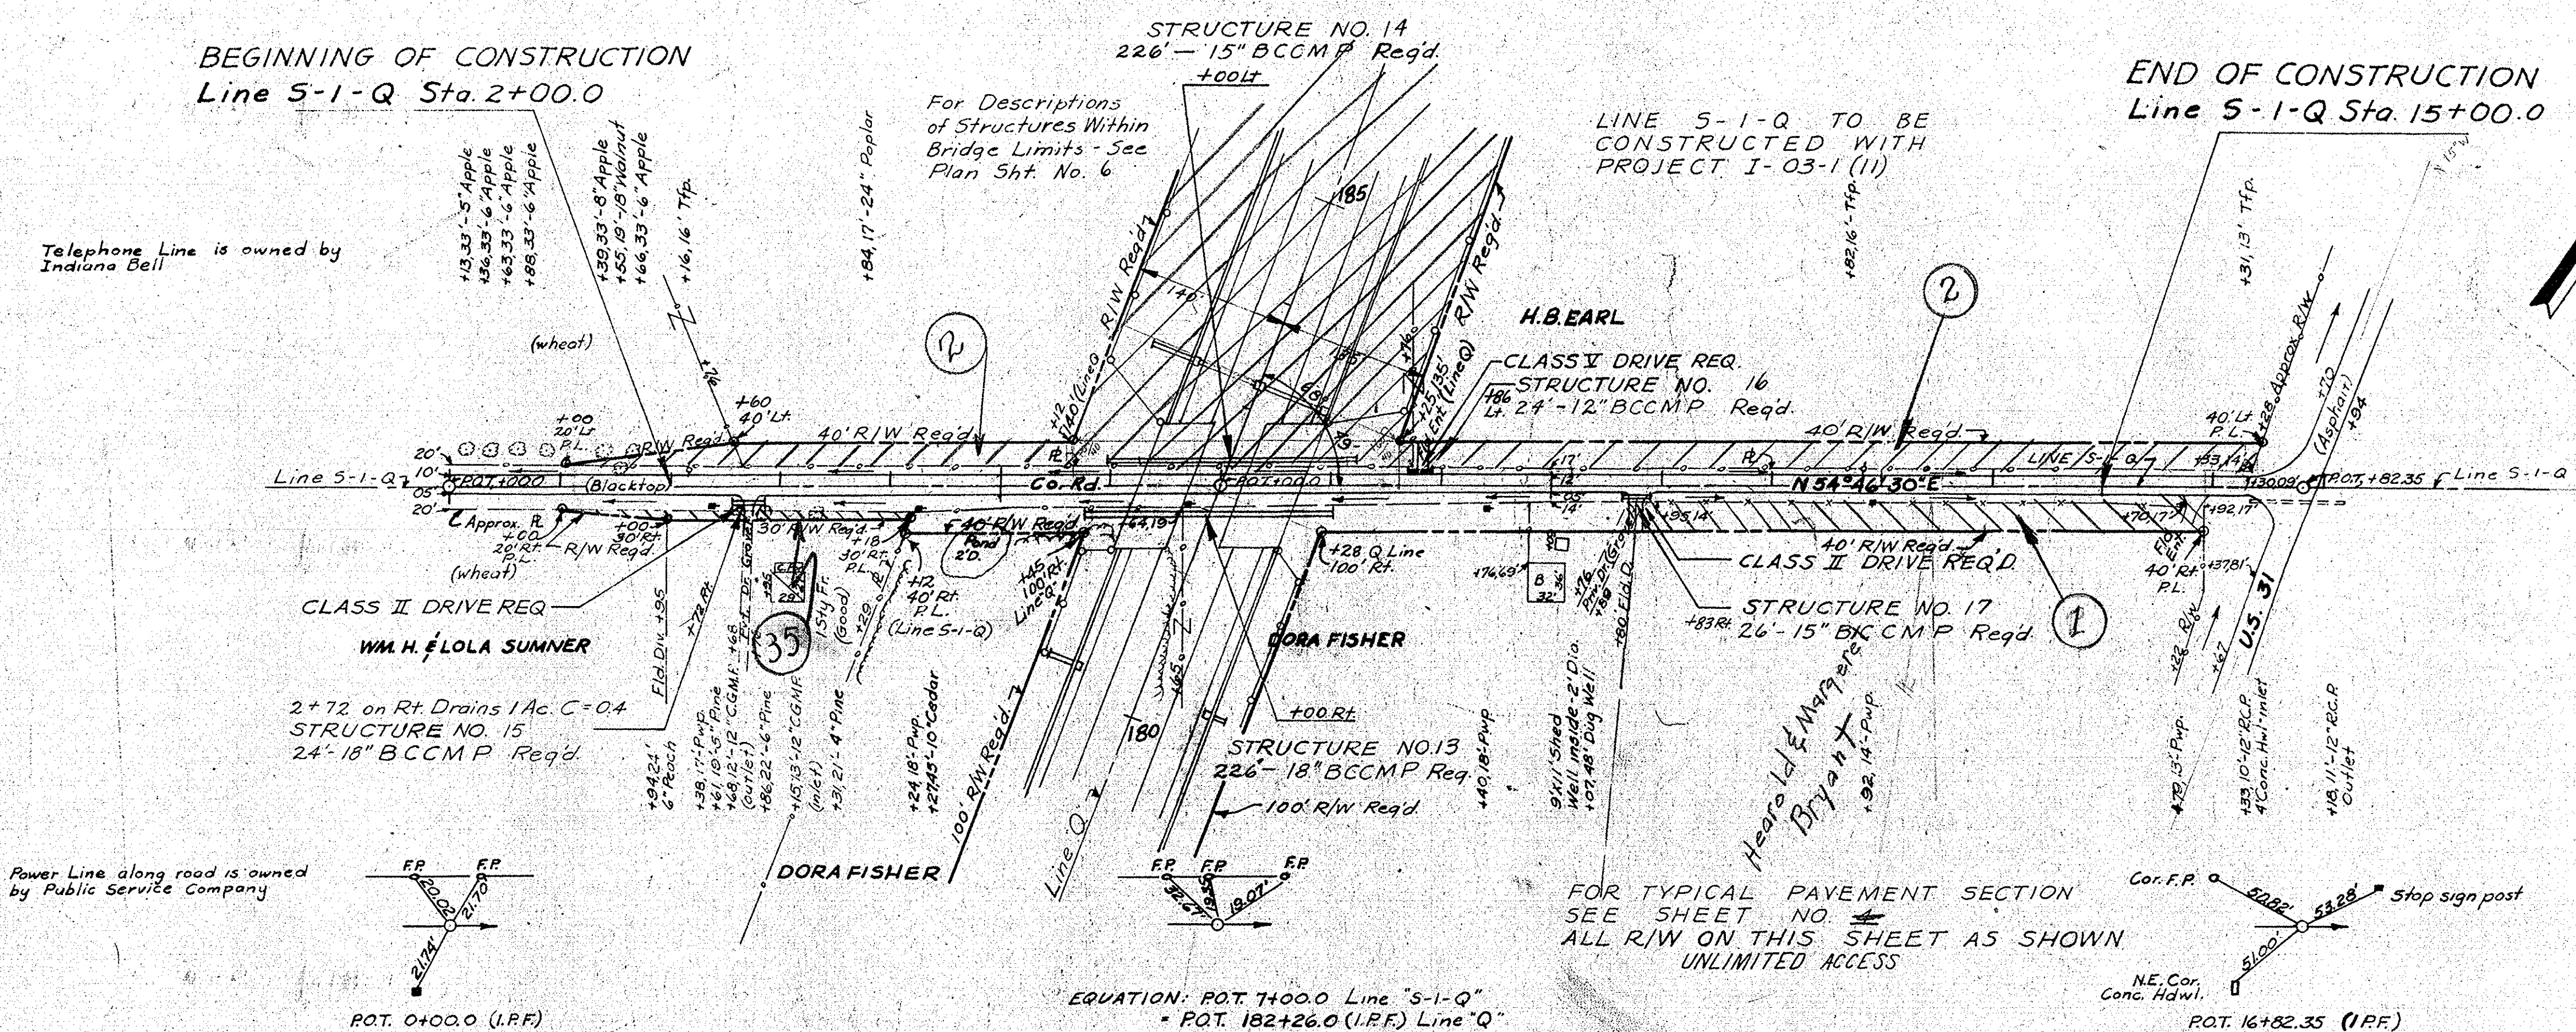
PLAN PROFILE O.P.R. & R.E. STANDARD
